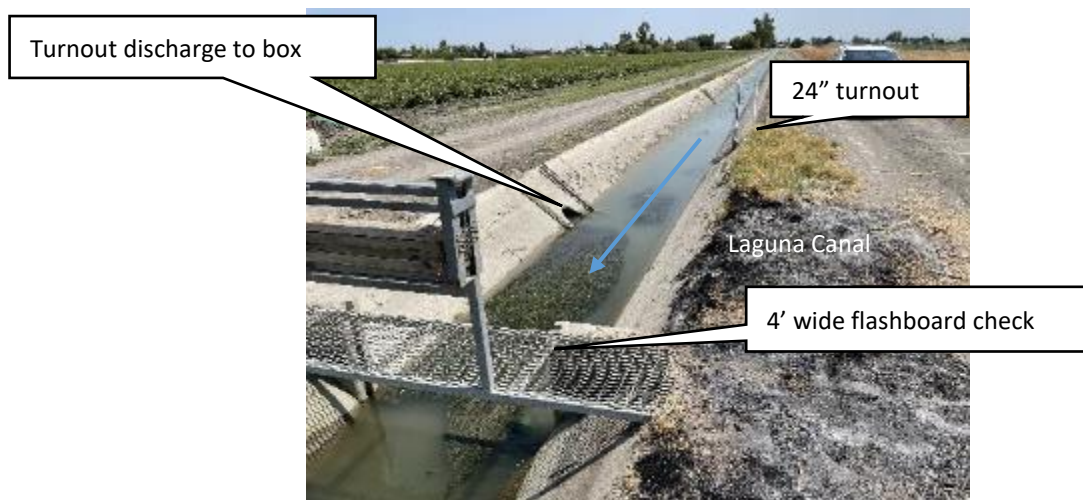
Laguna Canal flashboard check at station 51+68. The delivery water surface elevation upstream of the check is 112.5'. The field elevation to the east (left in photo) is 110.9'.
